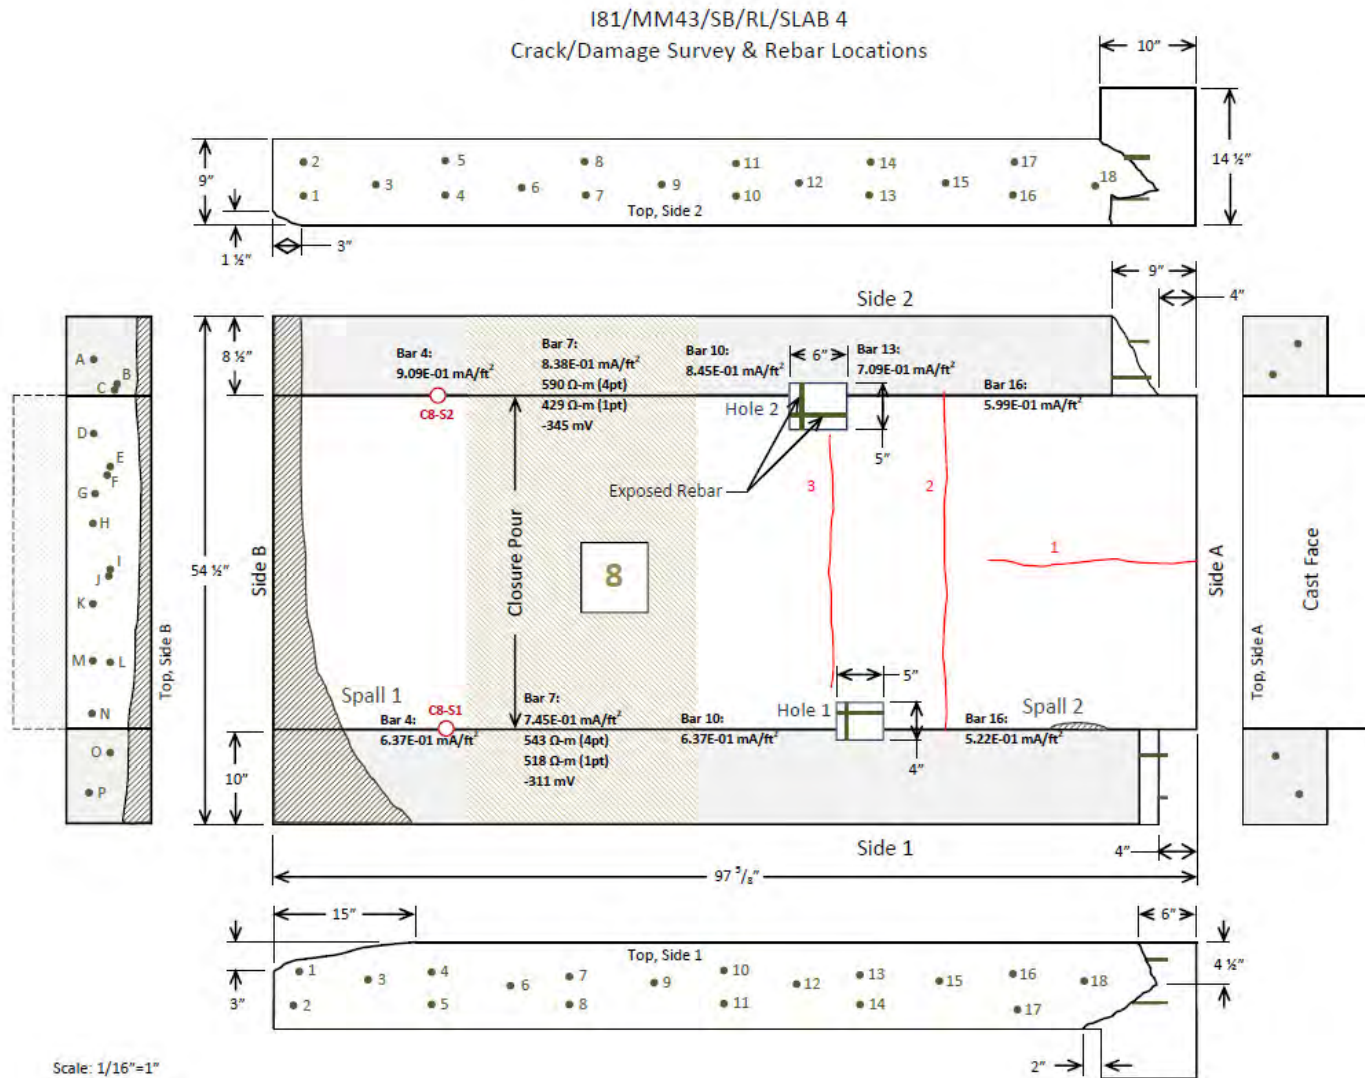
Crack, Damage Survey, and Rebar Locations for Slab 4
